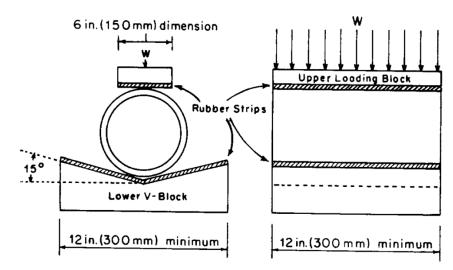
Crushing test configuration per ASTM C500 (2011)
